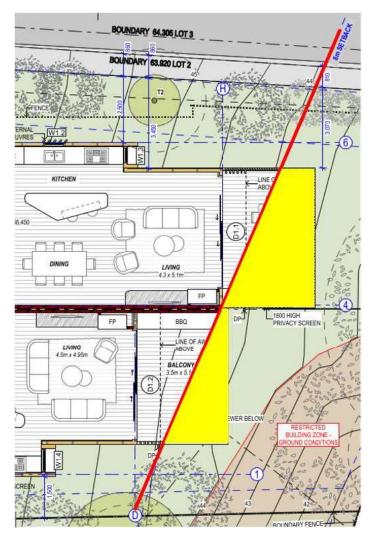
Extract of ground floor plan showing rear boundary and 8m setback lines in red and second storey encroachments in yellow.
